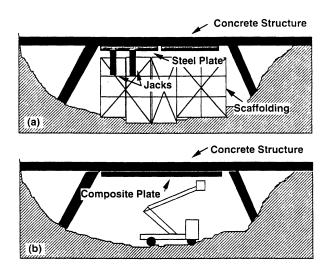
External strengthening through the use of externally bonded reinforcement plates: (a) steel plates; (b) composite plates.
